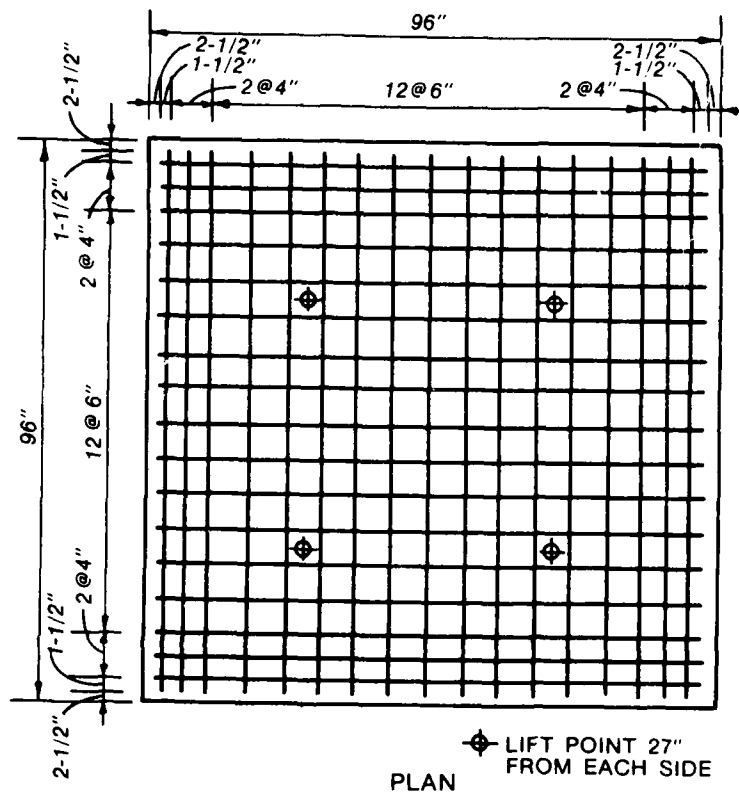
Design of 8-Foot by 8-Foot Reinforced Precast Slab.
